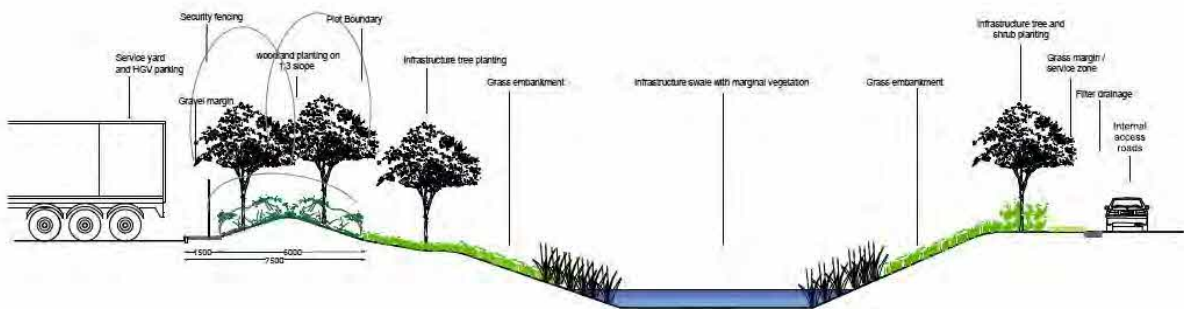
D: Perimeter landscaping adjacent to a swale between plot parking/circulation road and infrastructure corridors (7.5m)
